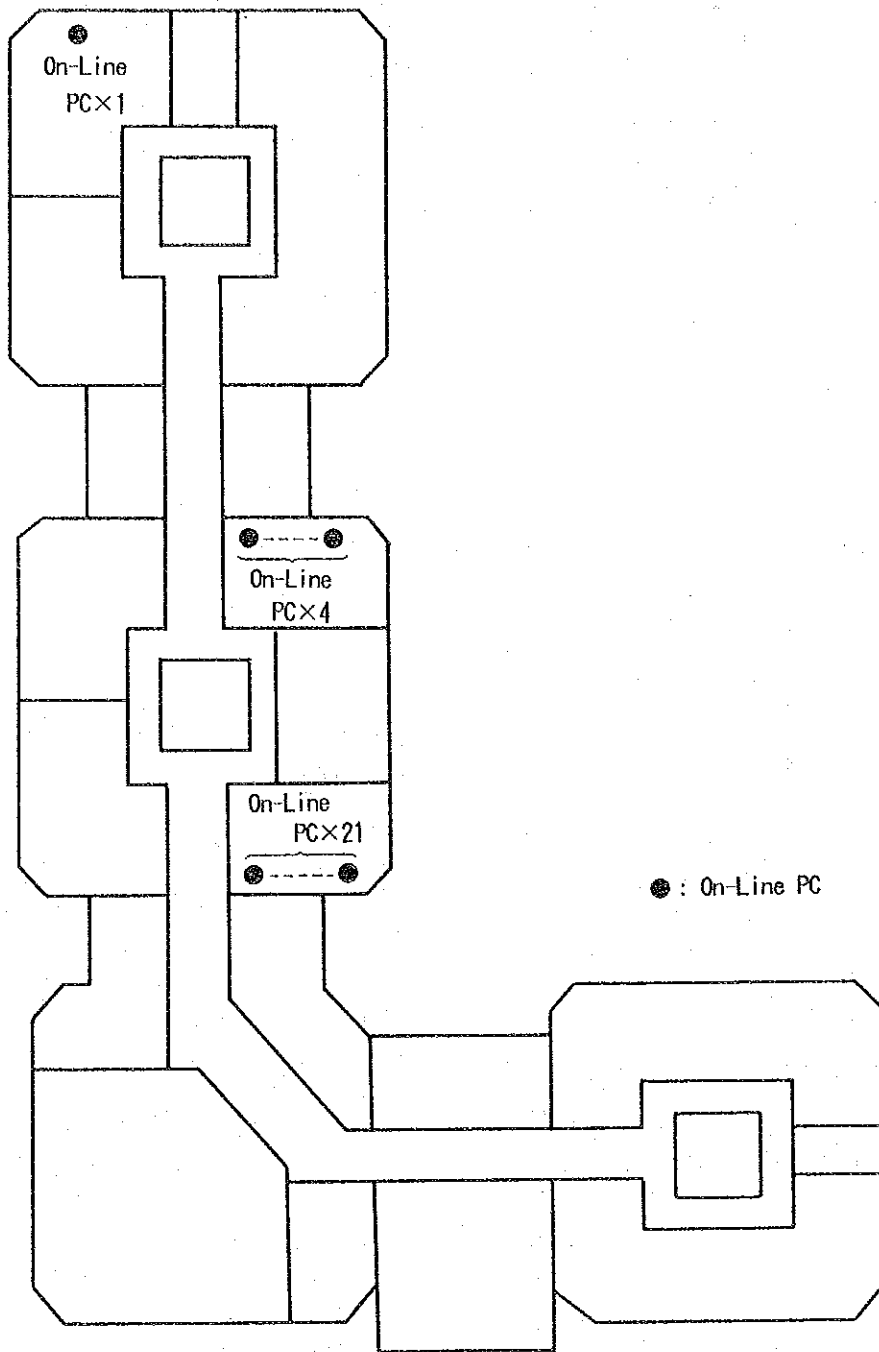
Floor Layout Plan of On-line Personal Computers (2/3)
